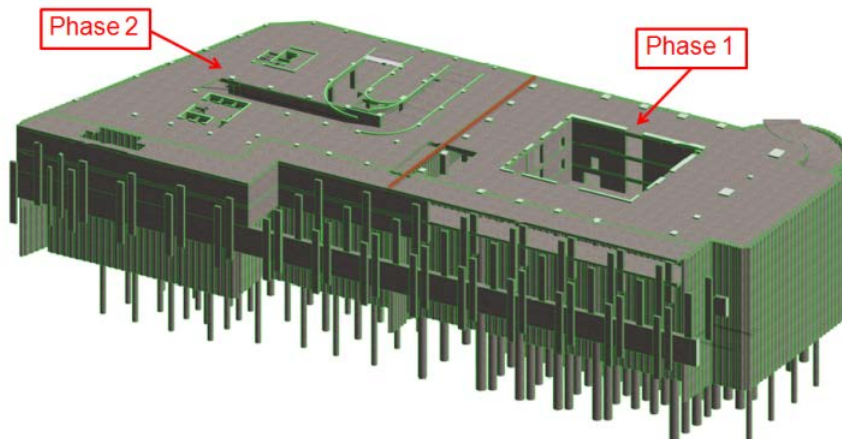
Pile Raft Foundation with Bored Pile Retaining Walls
